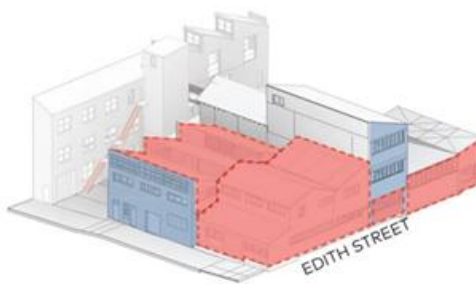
Building and building parts to be retained. Source: MDCP 2011 - Part 9.48
